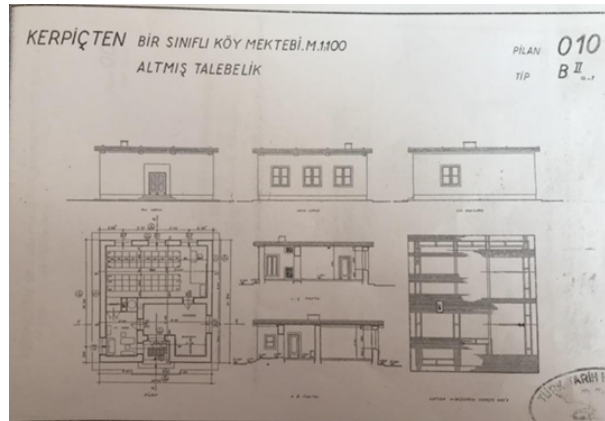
A Village School with a Classroom of 60 Students Designed by the Construction Bureau and Required to be Built with Adobe Material (From the Primary School Plans Album)
